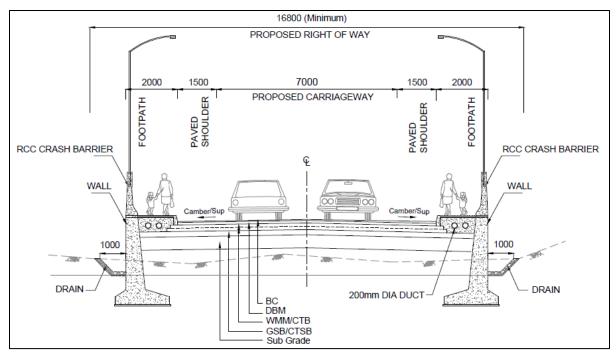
TCS-3: Typical Cross Section for 2 Lane in Greenfield (High Embankment)
